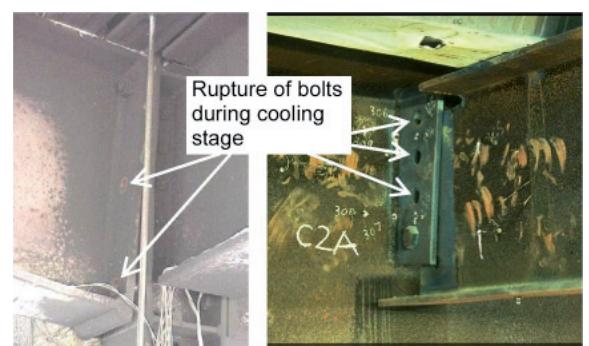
Failure of bolts in steel connections subjected to natural fire
